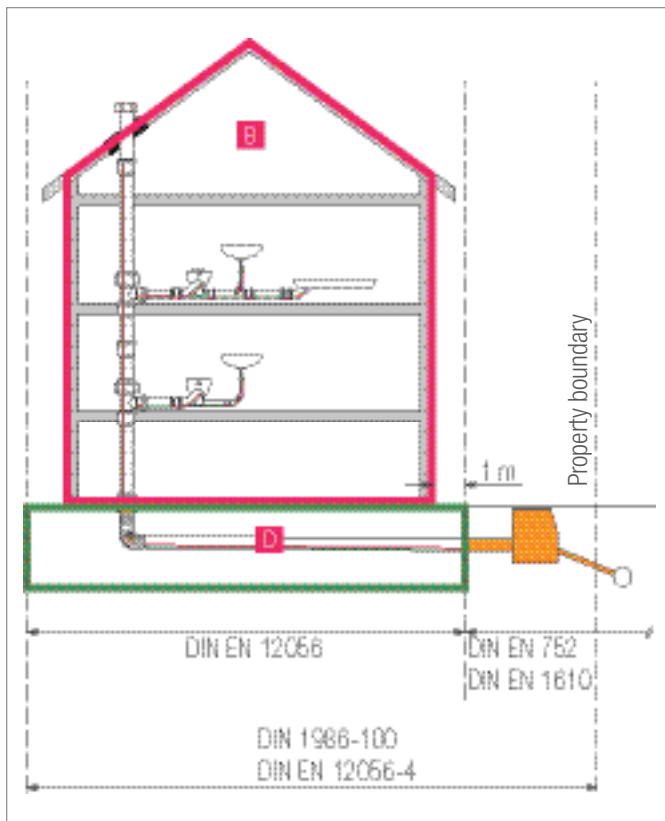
Installation of RAUPIANO PLUS inside and below the building structure
